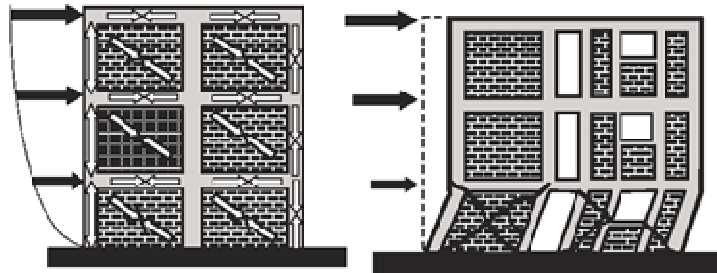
Confined masonry building: vertical truss model (left) and collapse at the ground floor level (right)
